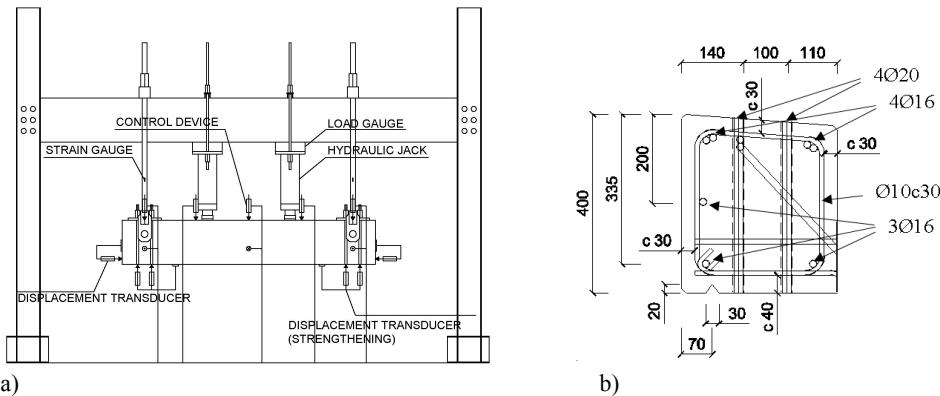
(a) Test-setup, and (b) cross-section of tested beams
